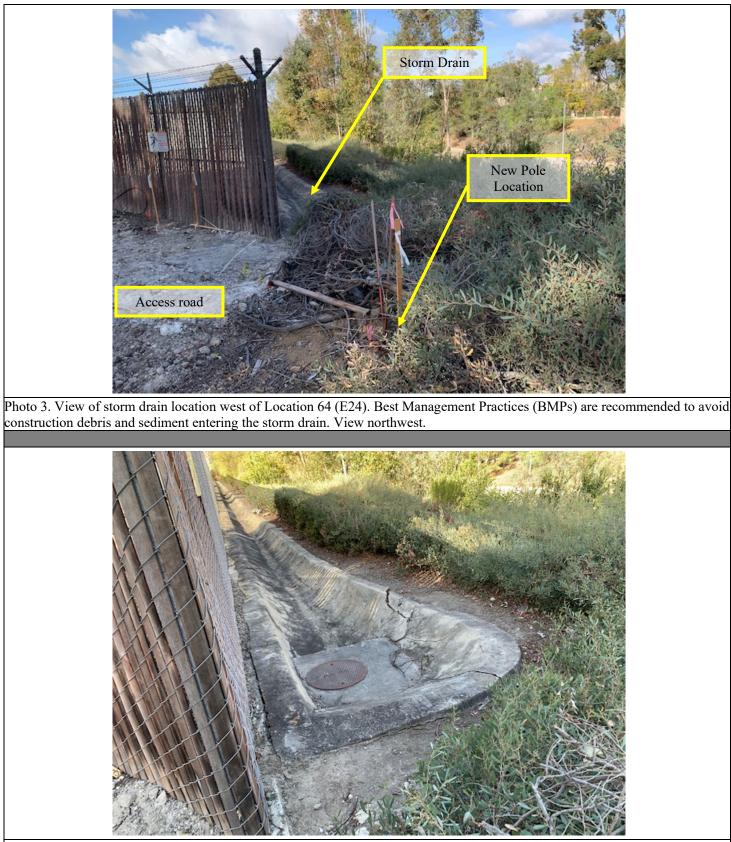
Closer view of storm drain and V-ditch that runs along the northern side of the Rancho Carmel Substation, west of Location 64 (E24). View northwest.
